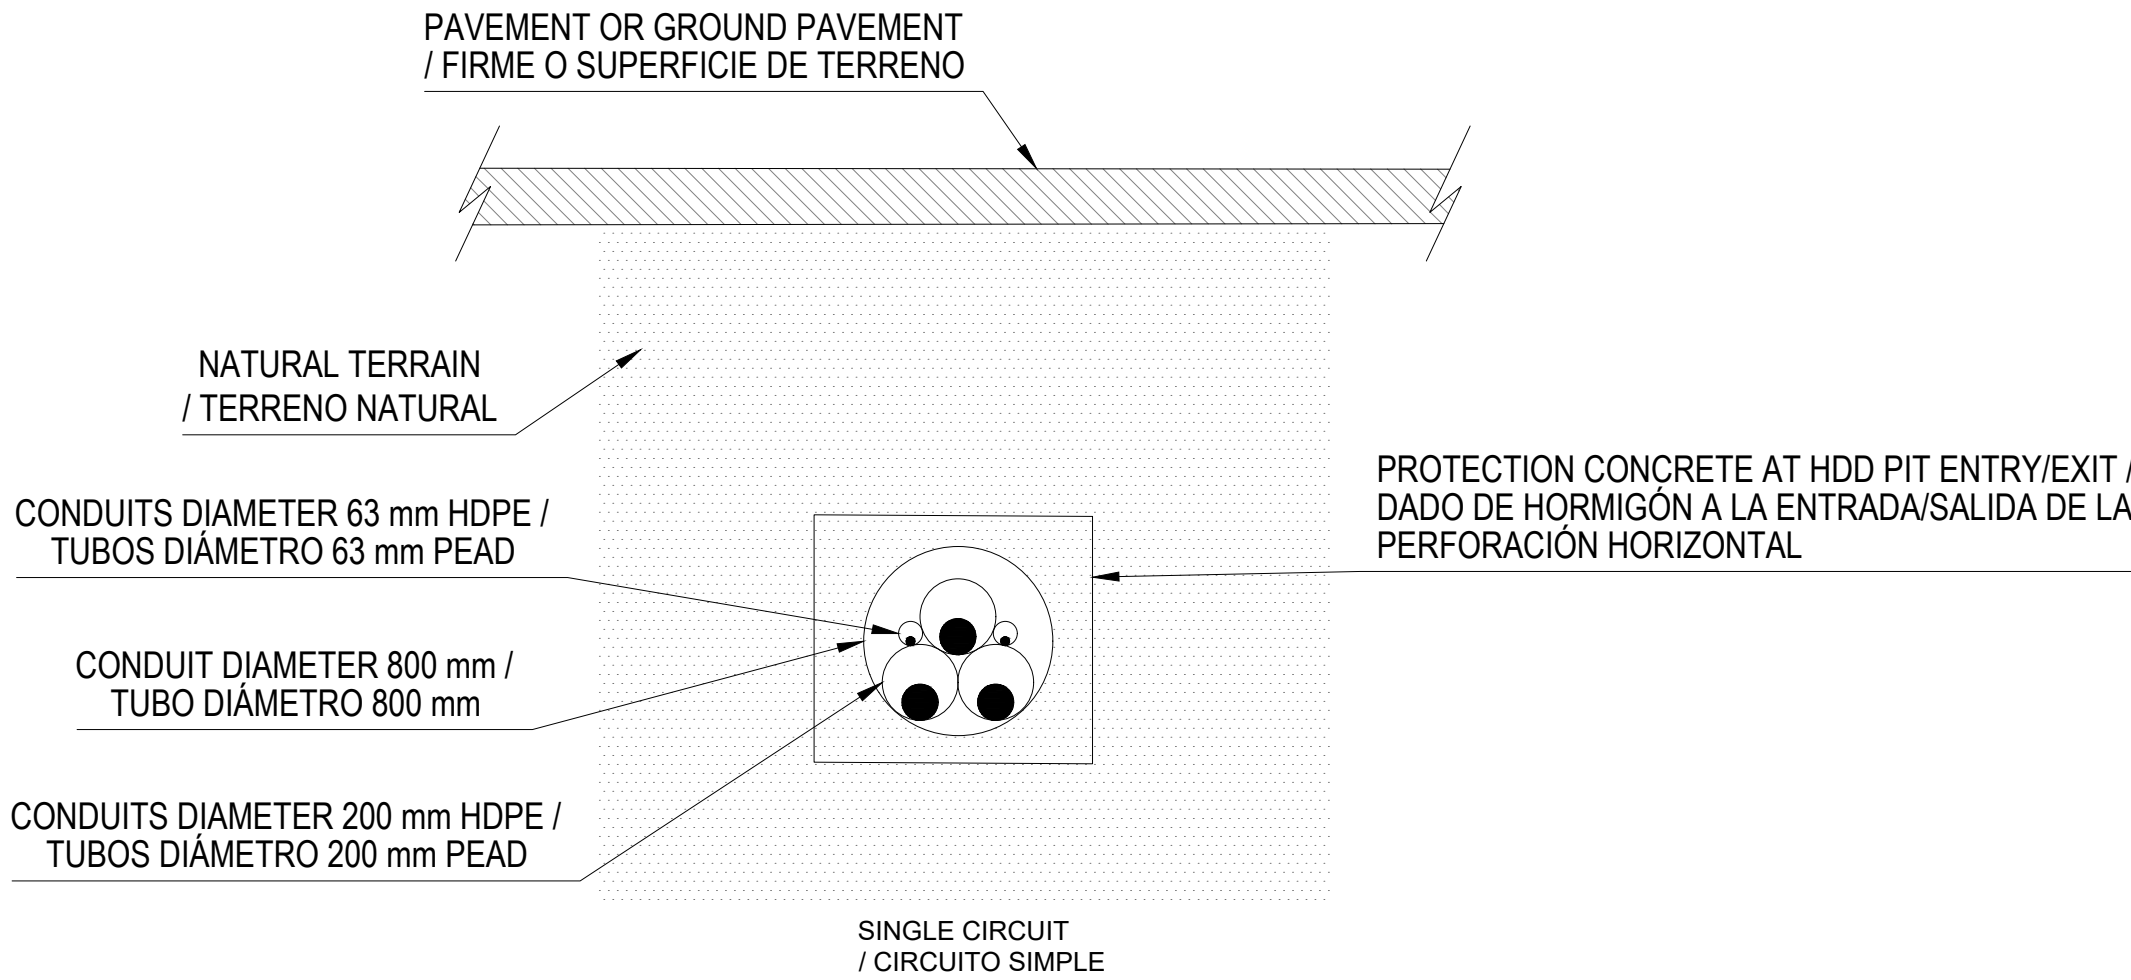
TYPICAL CROSS SECTION FOR UNDERGROUND HIGH VOLTAGE TRENCH
